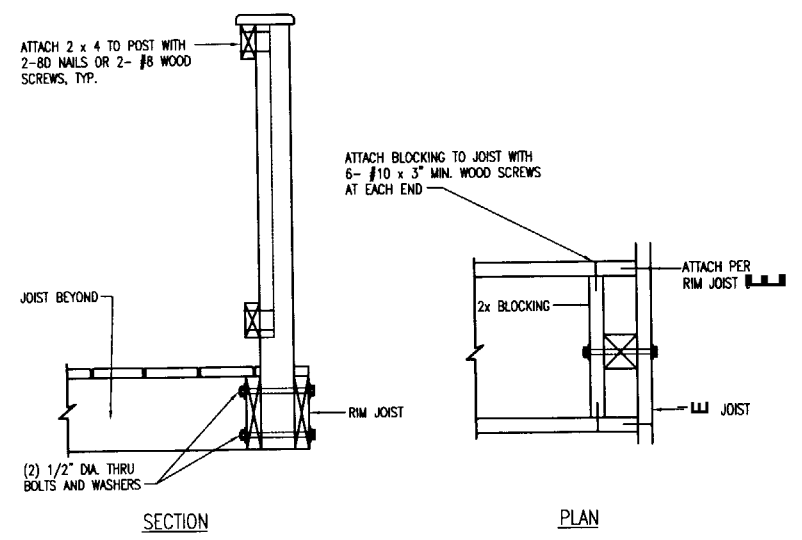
GUARD POST TO RIM JOIST DETAIL - OPTION 1
